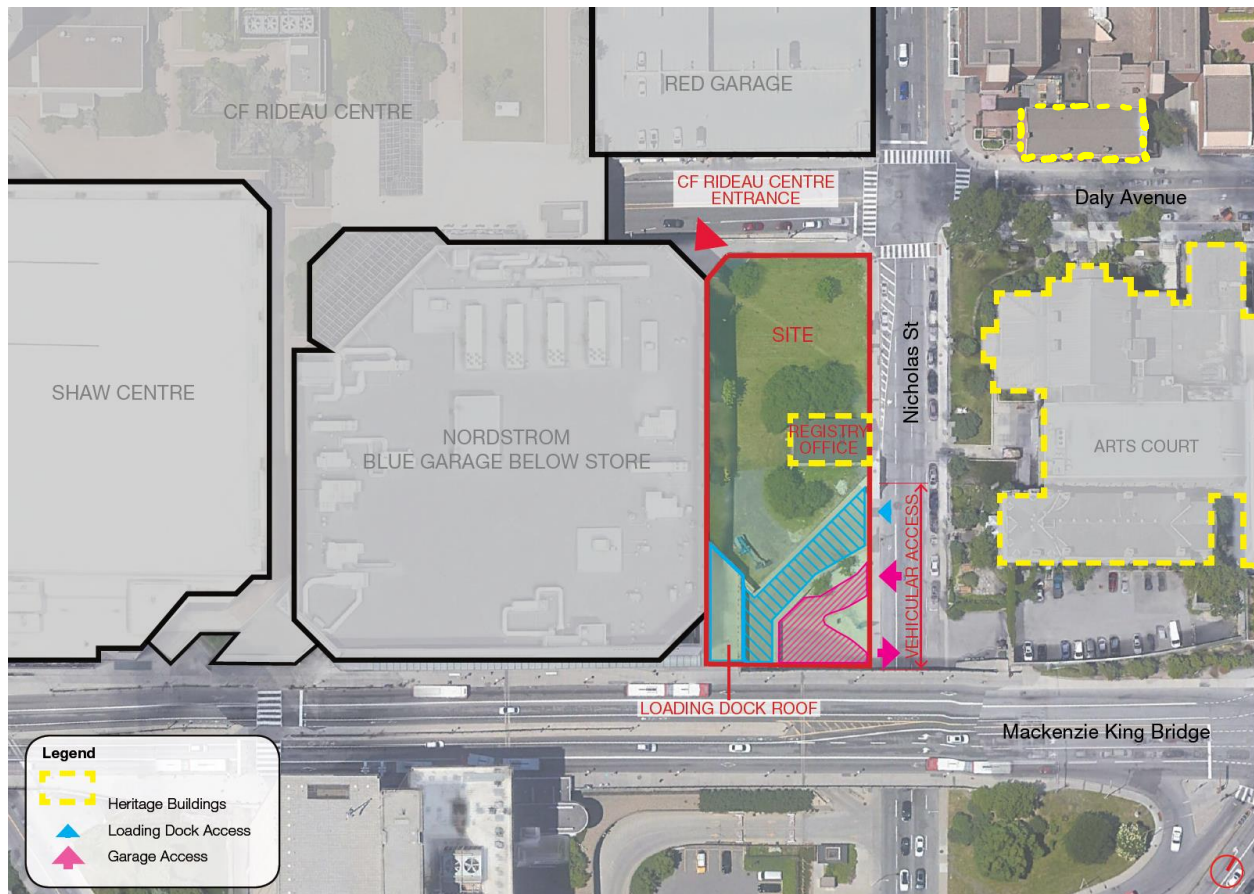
Context plan of the area and the proposed development site illustrating the built context and uses.
